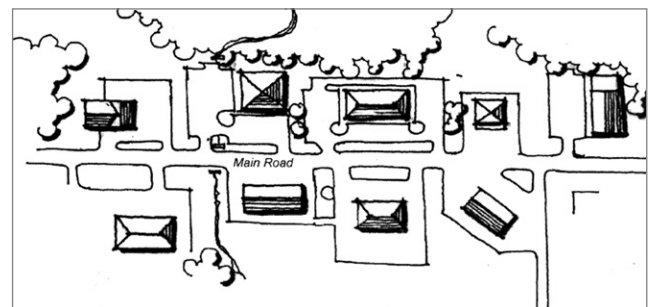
Plan illustrating negative impacts of multiple curb-cuts, removal of vegetation, wasted pavement for parking, and hazardous vehicle entries and exits.
